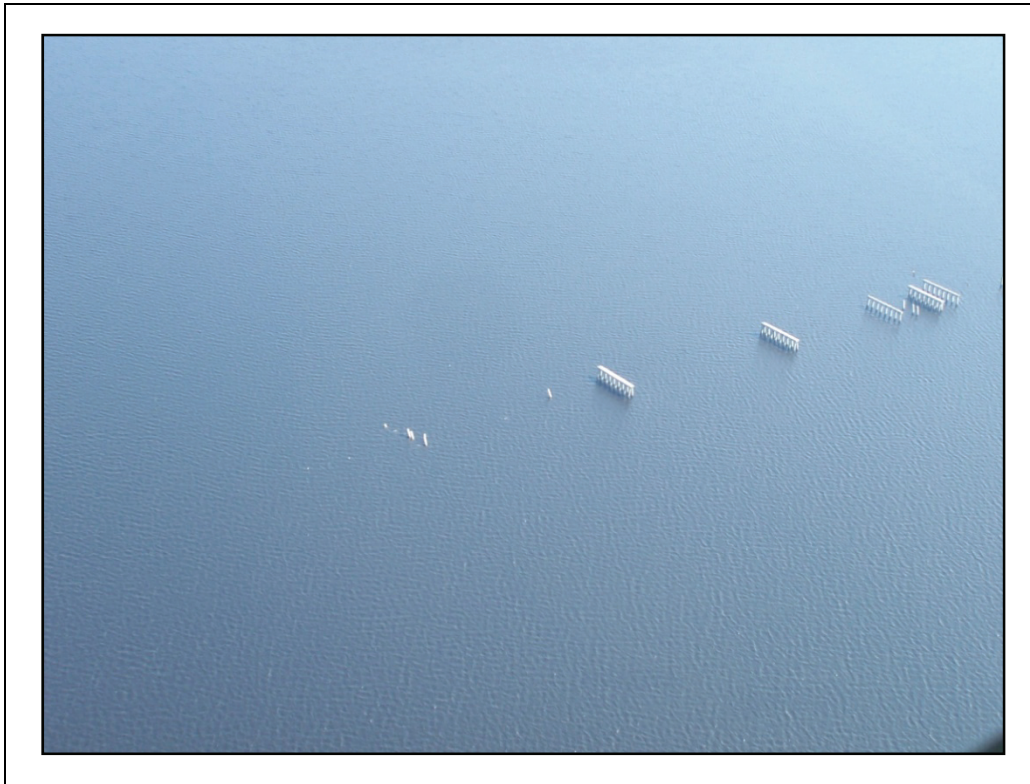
Many US-90 piers scoured out. The photo was taken facing SW.
